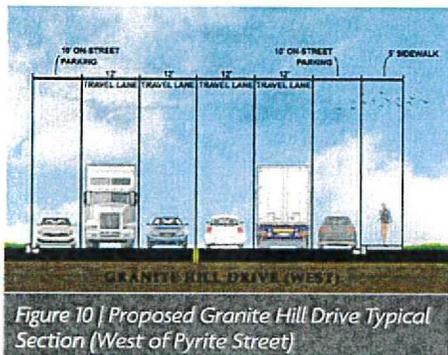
| Proposed Granite Hill Drive Typical Section (West of Pyrite Street)
